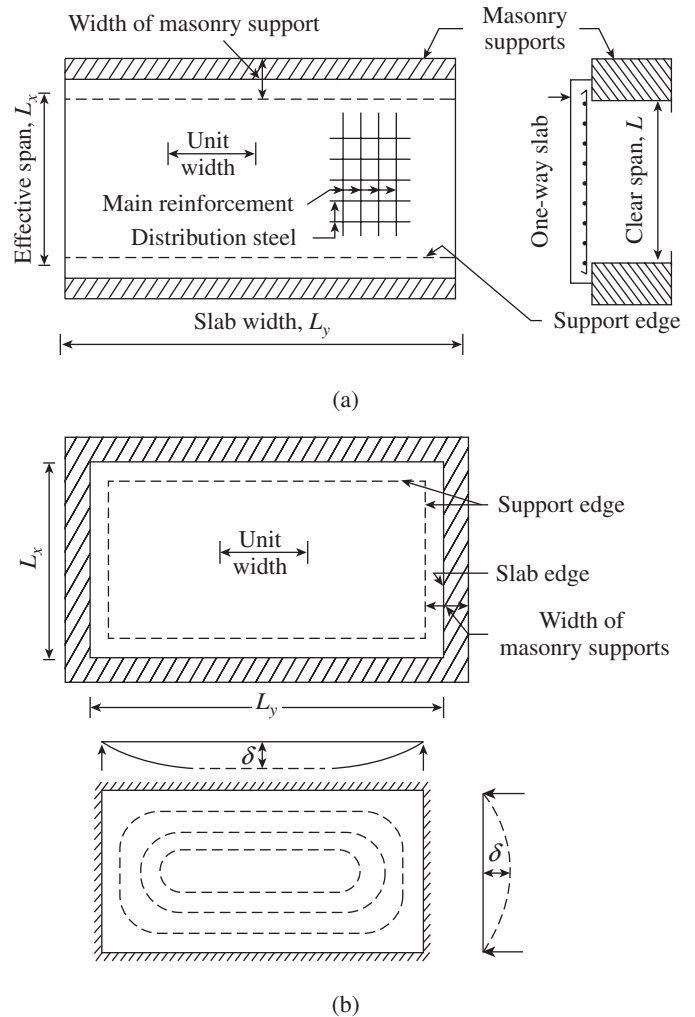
One-way action in slabs (a) Typical one-way slab resting on masonry walls (b) Deflection contours of long slabs ($L_y/L_x \geq 2.0$)
